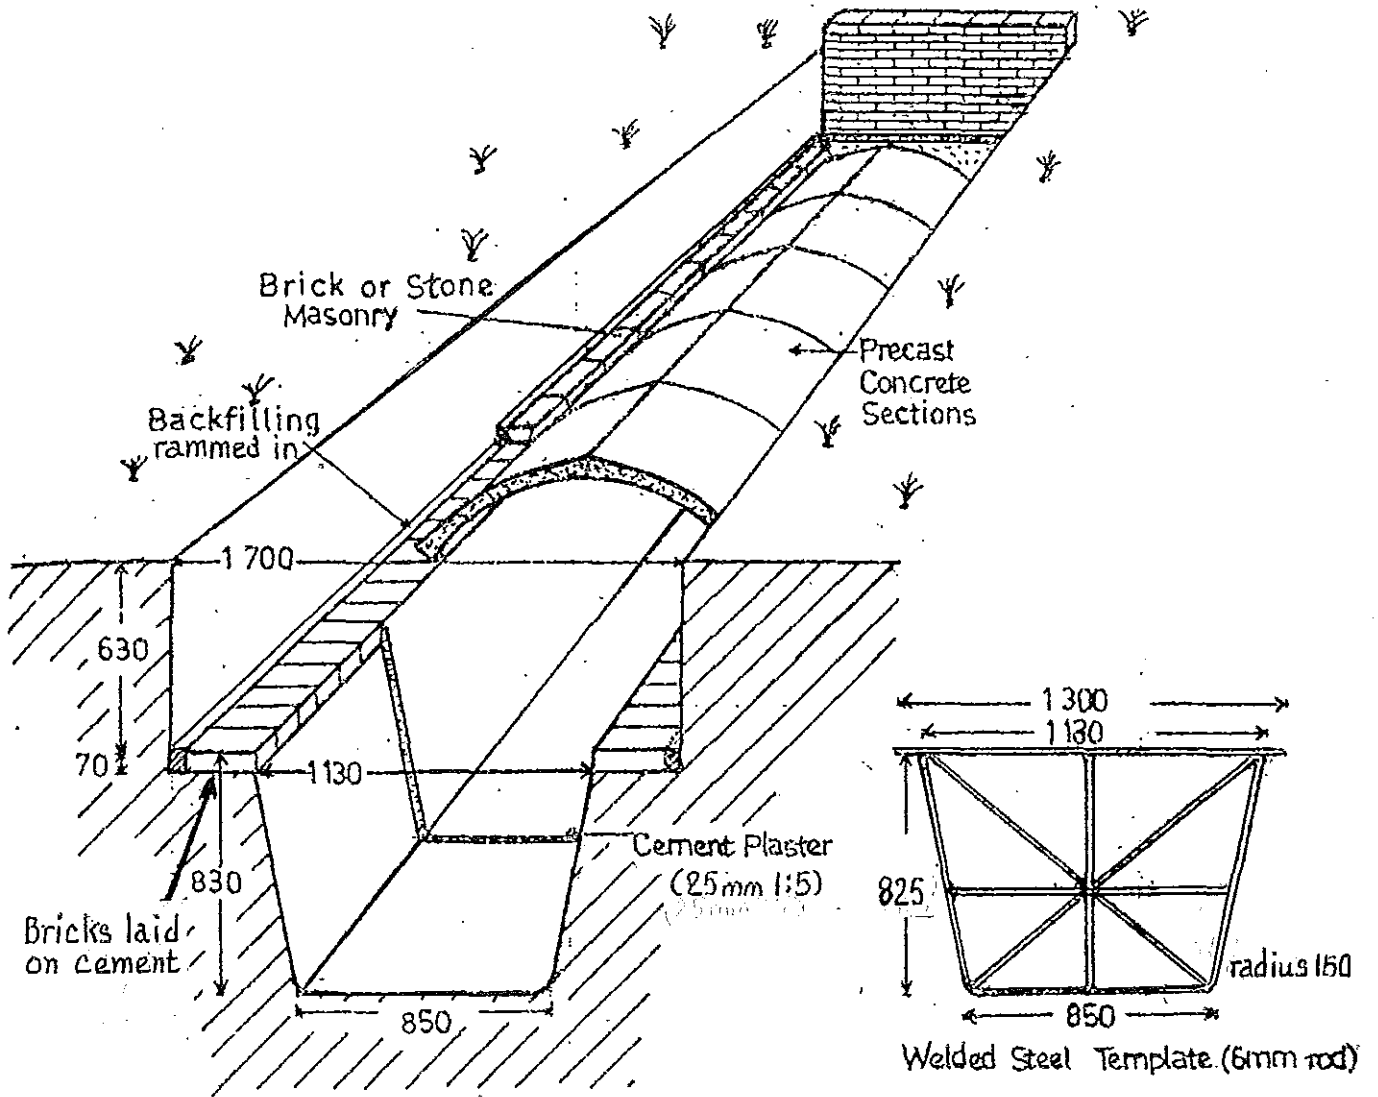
Tunnel Plant Design, with Plastered Trench
